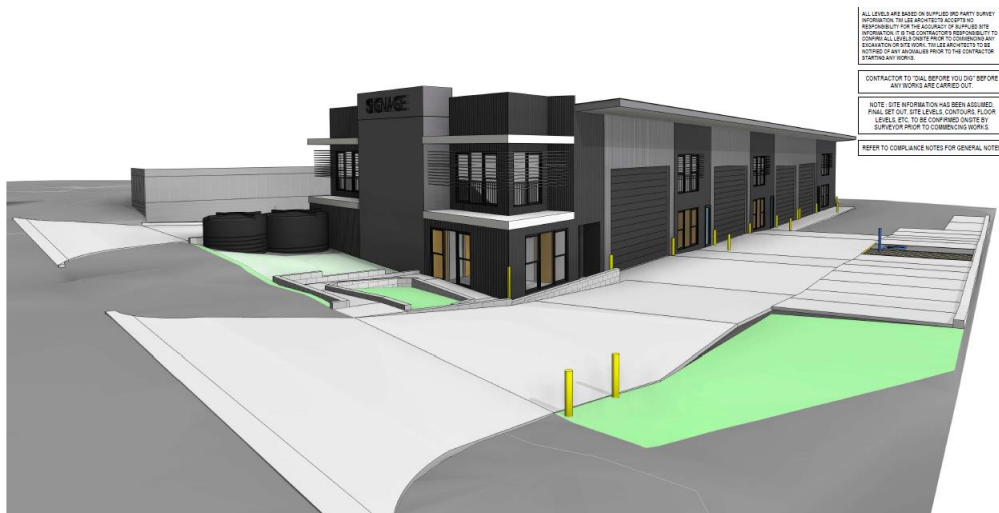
Conceptual visualization of the proposed Knox Street elevational treatment (TLA)
